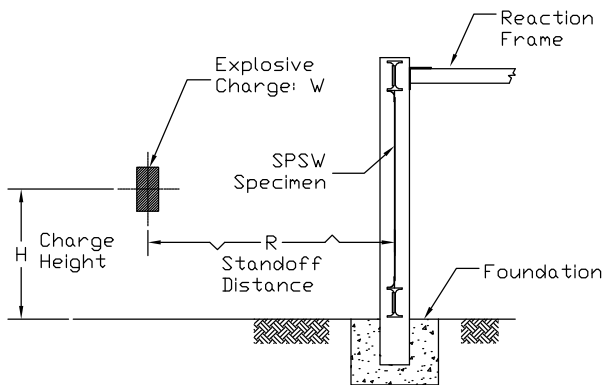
Illustration of the side view of a specimen showing generic placement of explosive charge
